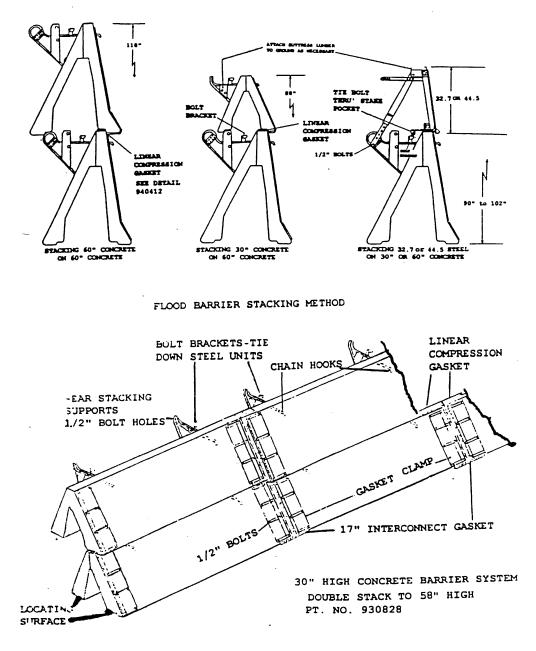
RICHARDSON'S CONCRETE FLOOD BARRIER
